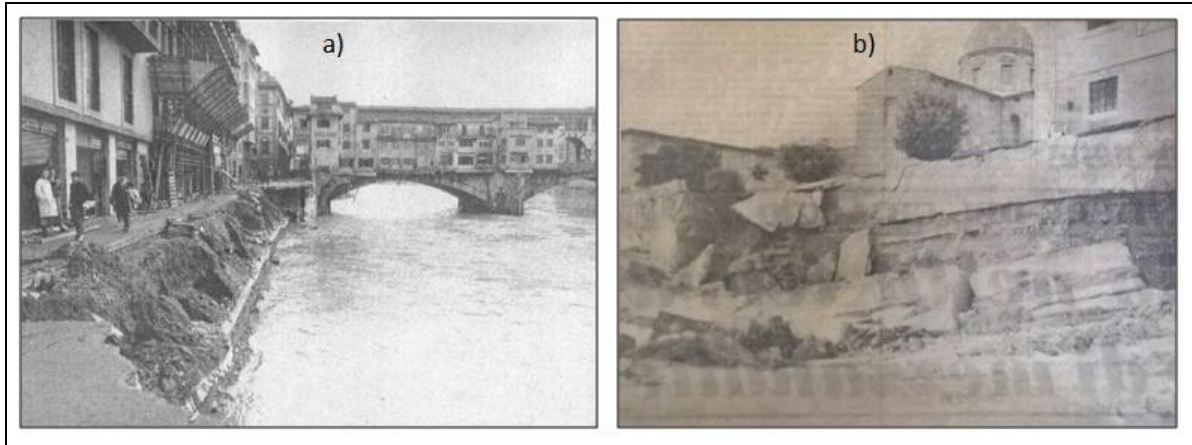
a) Photo of Lungarno Acciaiuoli embankment eroded in 1966 by the violence of the waters (from Principe I. and Sica P., 1967); b) Photo of the embankment wall and the roadway of Lungarno Soderini collapsed on 4 July 1965; from “La Nazione” newspaper of 5 July 1965, Chronicle of Florence.
